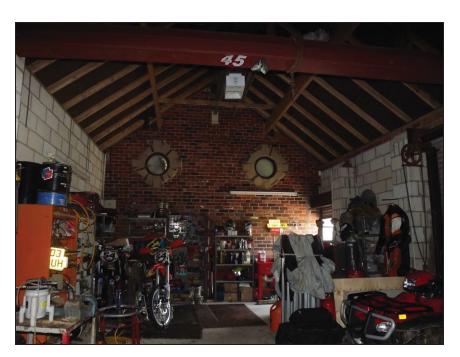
View looking south-east within the interior of the garage/workshop showing the modern circular windows of a first floor bedroom
